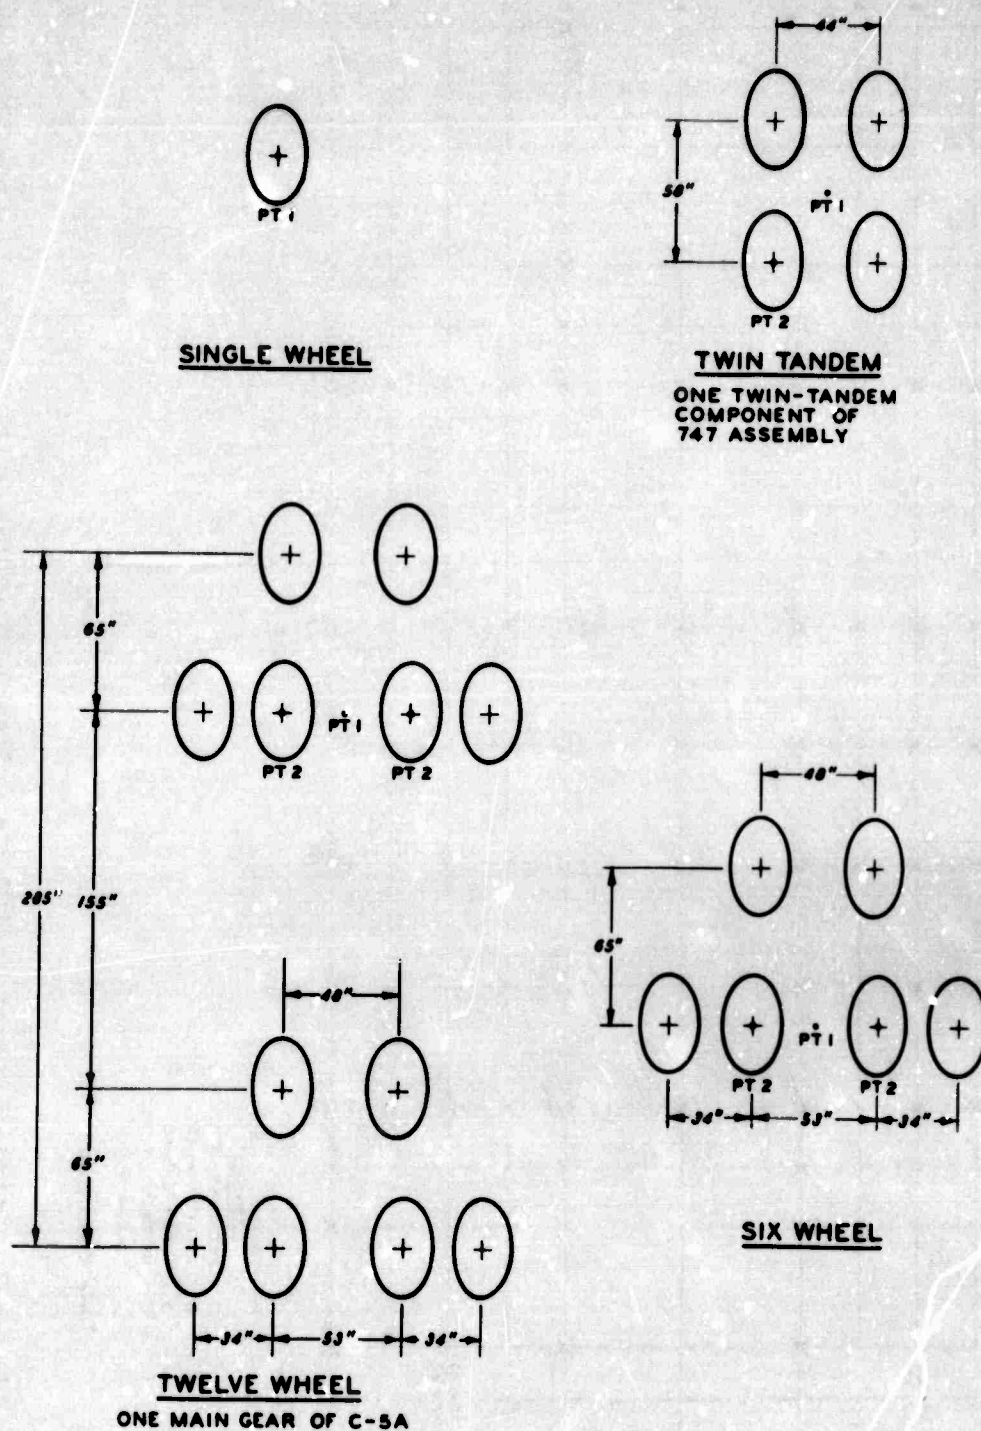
Locations of Loading Points of Wheel Assemblies Used in the Flexible Pavement Tests
